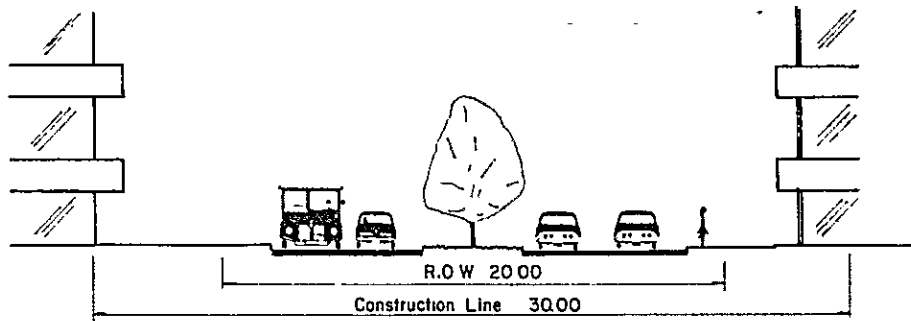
EXISTING CROSS SECTION OF VIA BRASIL
